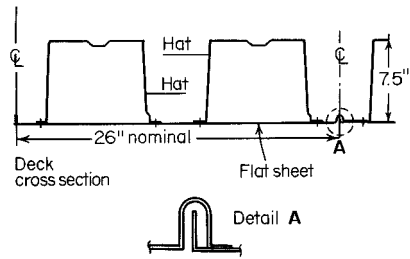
Cross section of steel deck used in superbay hangar. (*Lev. Zetlin Associates, Inc.*)^{1.82}
